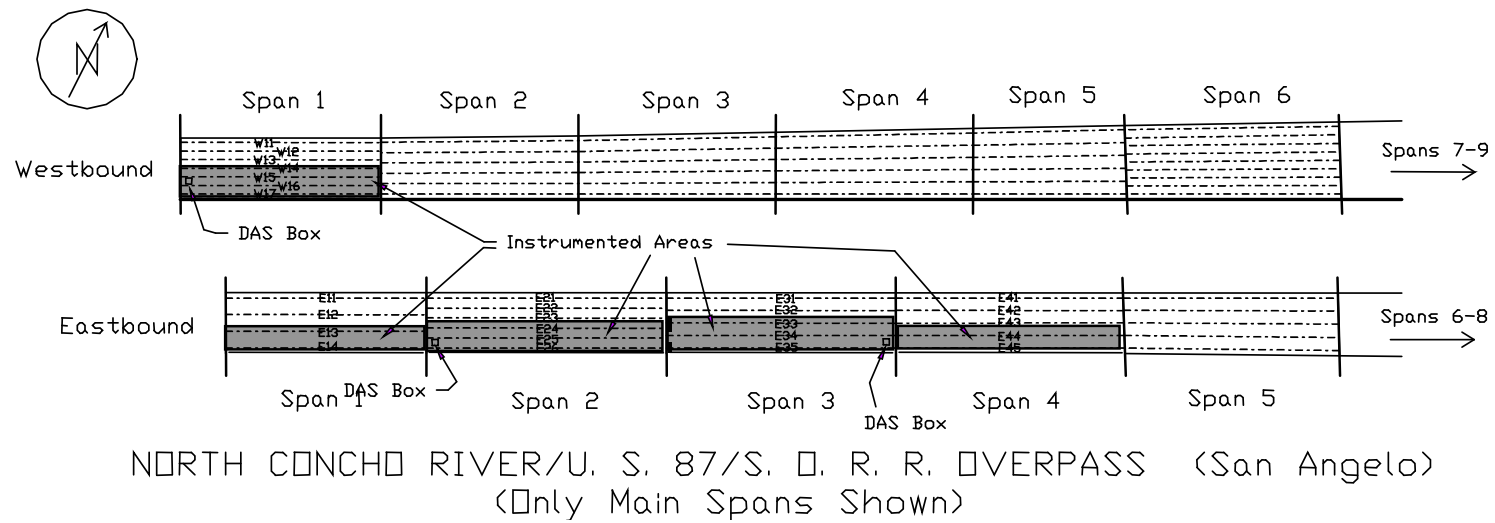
Instrumented Areas of San Angelo Bridges [10]
